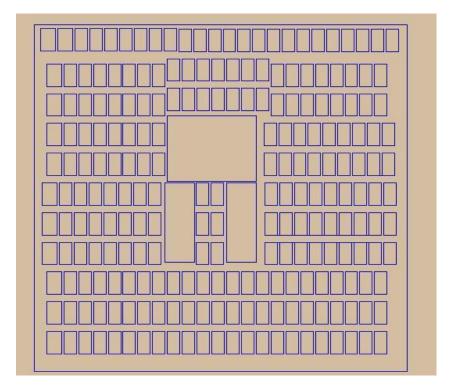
System arrangement of solar panels on the roof top by AutoCAD design
